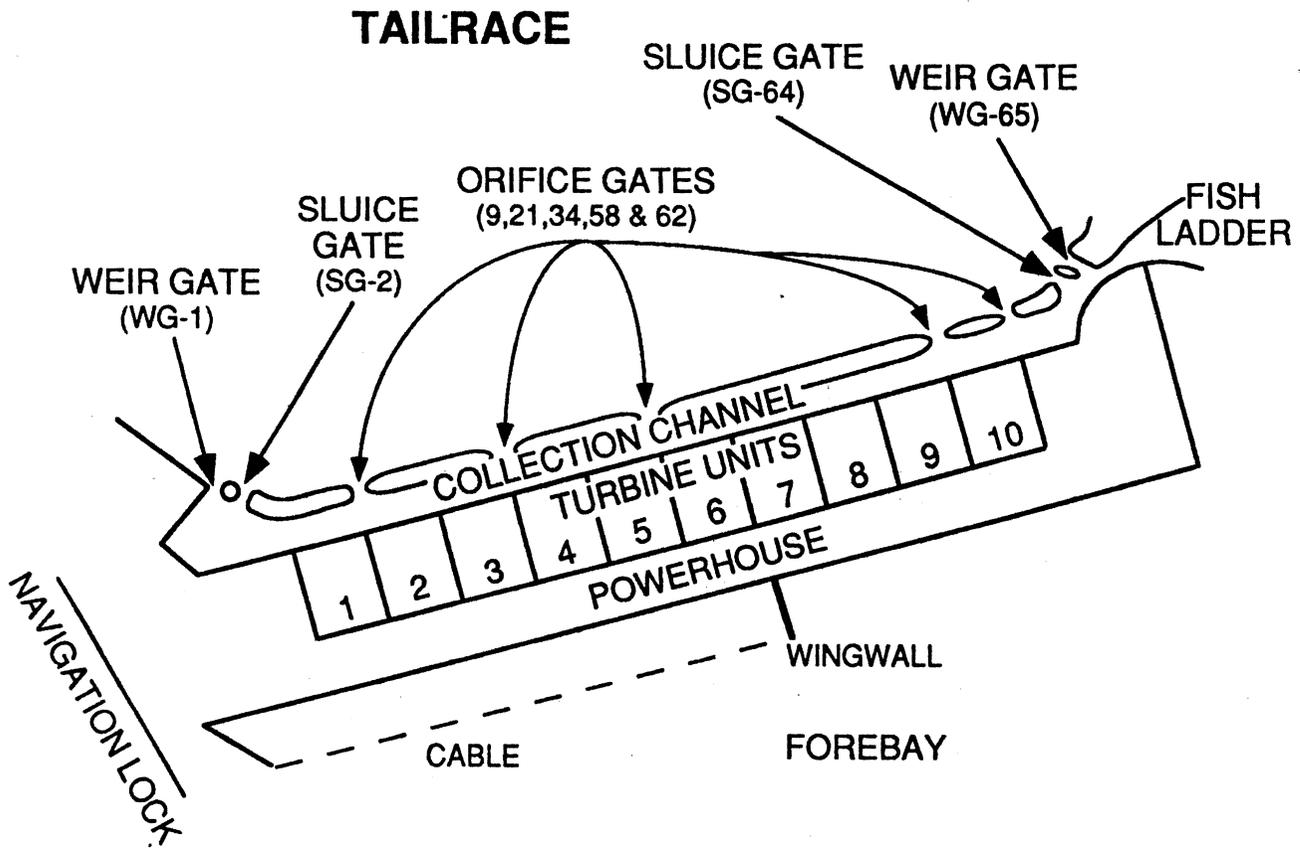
Location of adult fish attraction/collection system, forebay wingwall, and trashrack cleaning cable at Bonneville Dam First Powerhouse.
